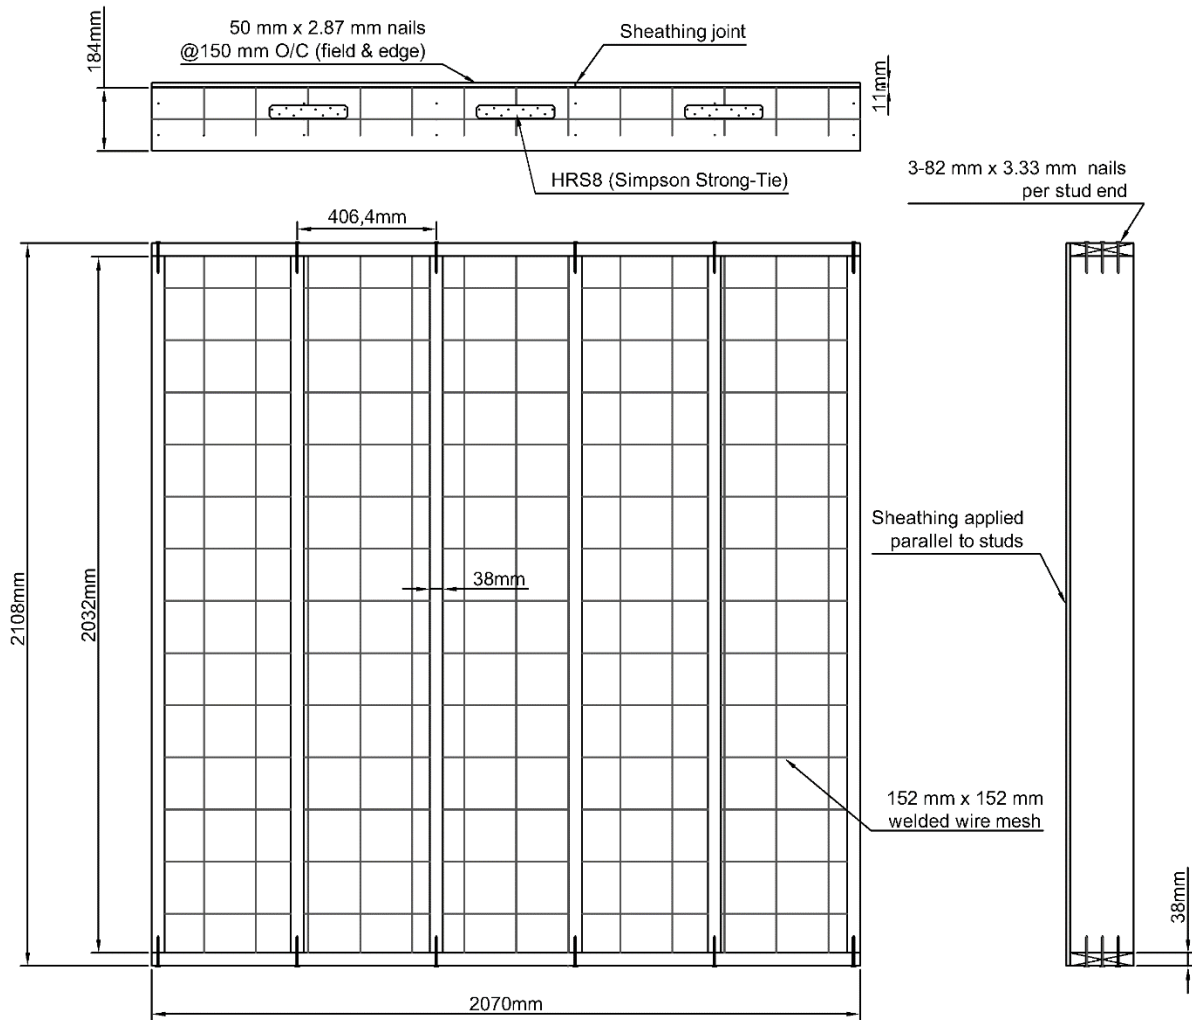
2 x 8 wall with WWM as OSB reinforcement
